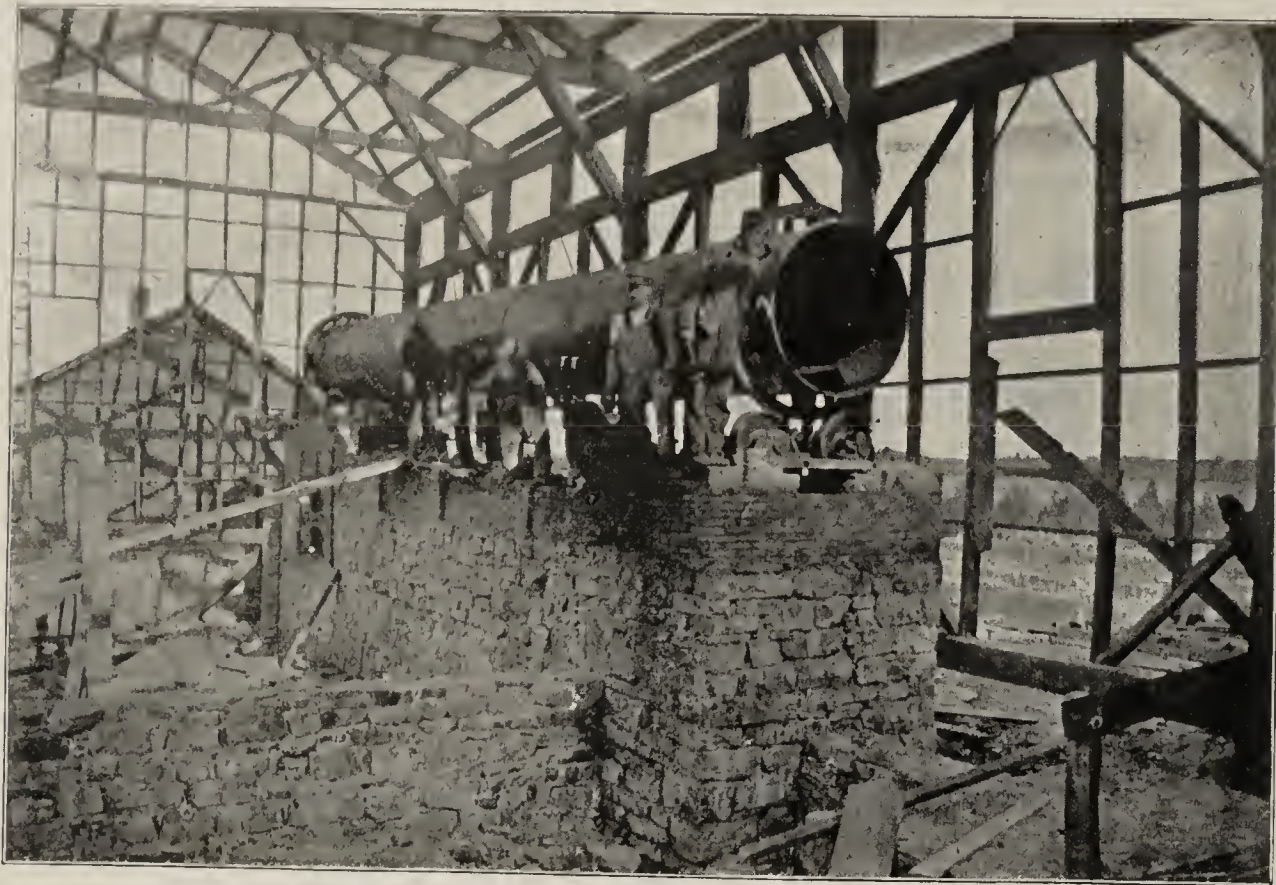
Frame work of coal drying building and coal dryer under erection.
